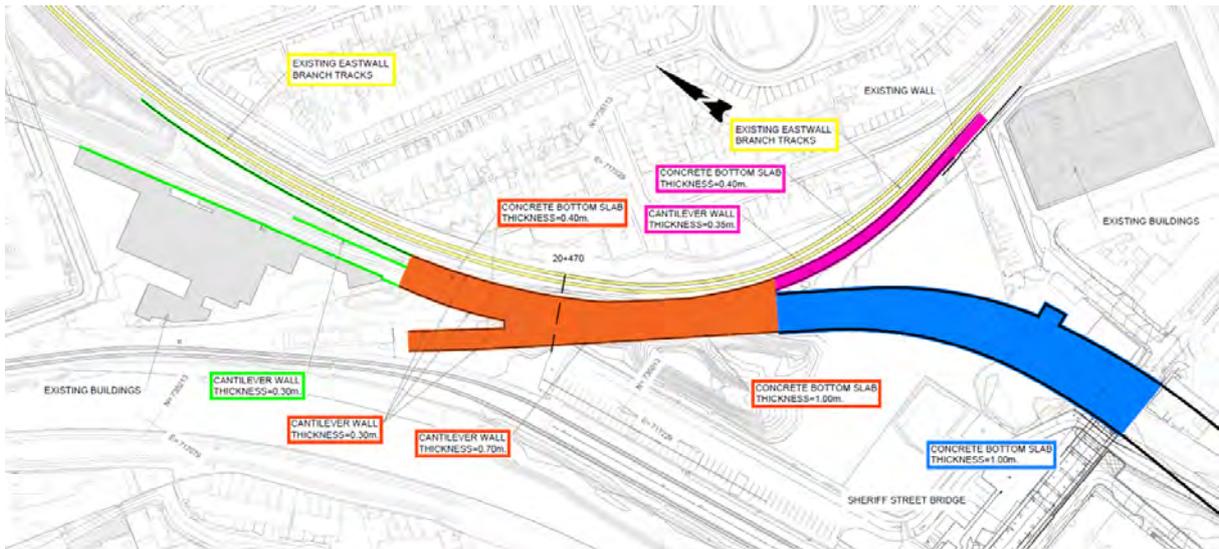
Phase 4 – construction of cantilever walls and bottom slabs
